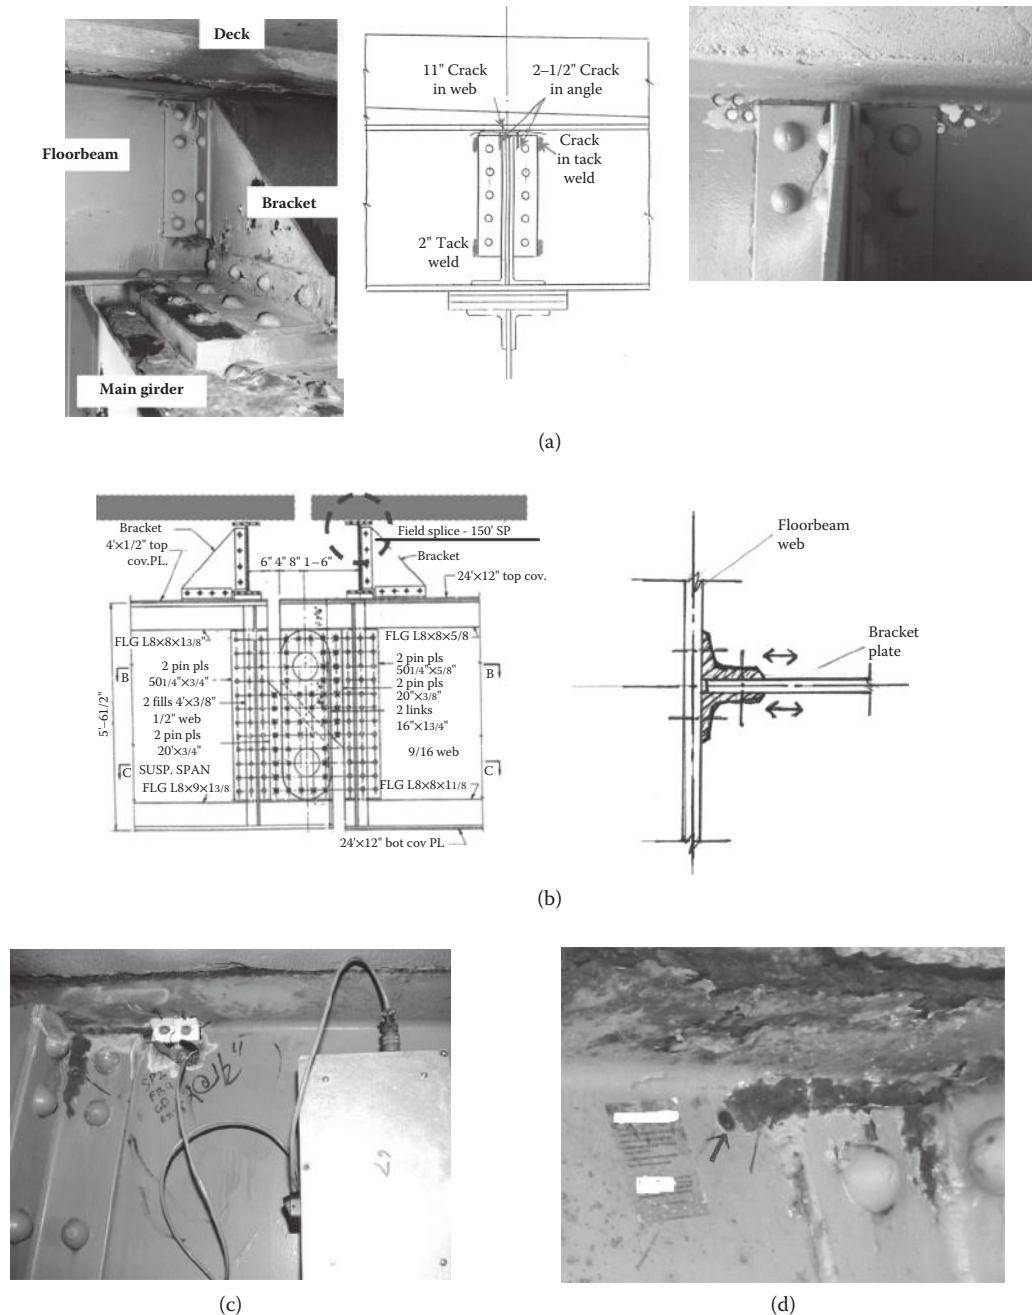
Fatigue damage, repair, monitoring, and suppressing for NJDOT Route 72 Manahawkin Bay bridge: (a) connection detail, fatigue cracks and hole-drilling repair; (b) relative movement between concrete deck and main girder caused out-of-plane bending; (c) fatigue crack growth monitoring using electrochemical fatigue sensor; (d) stop crack bushing.
